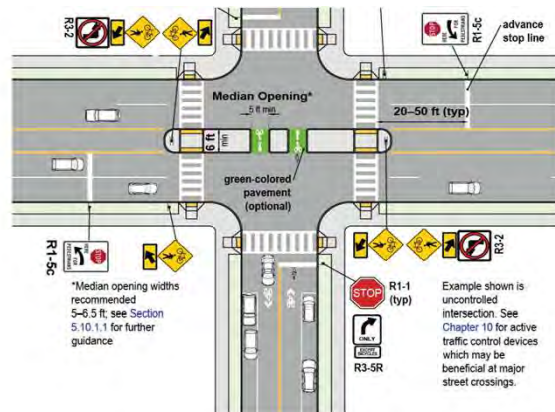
Example of a Median Used to Divert Traffic at a Major Street Crossing
